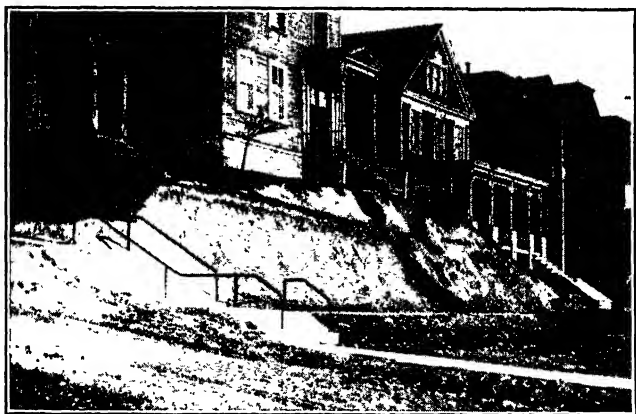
STEPS USED TO DESCEND FROM ELEVATED WALK TO ROADWAY
